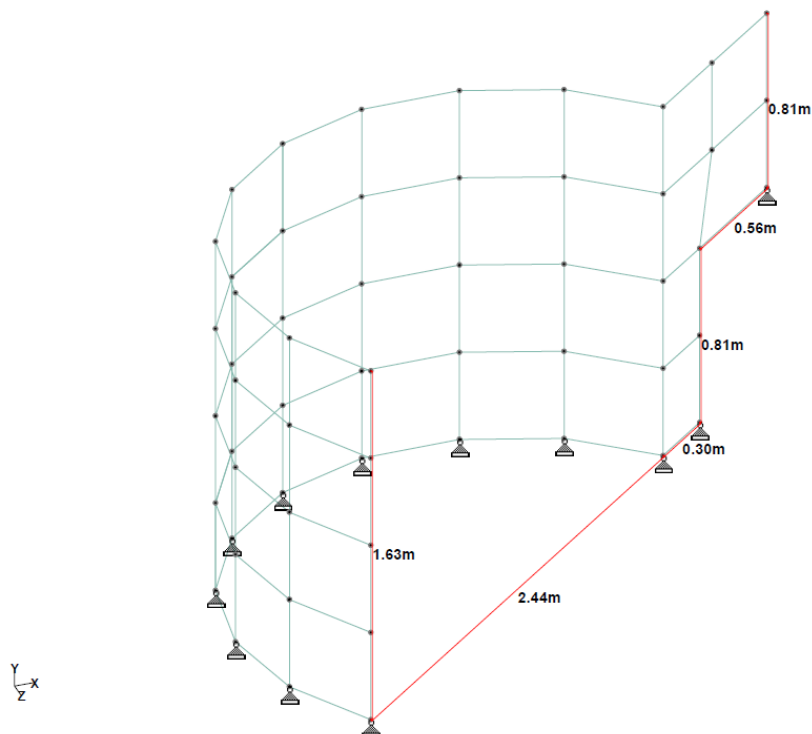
8 in Thick Curved Masonry Shielding Wall
